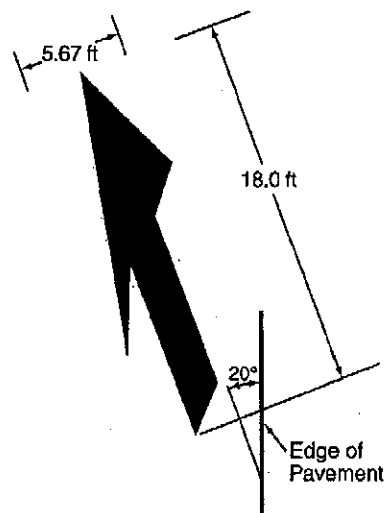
B-24. Examples of Standard Arrows for Pavement Markings
